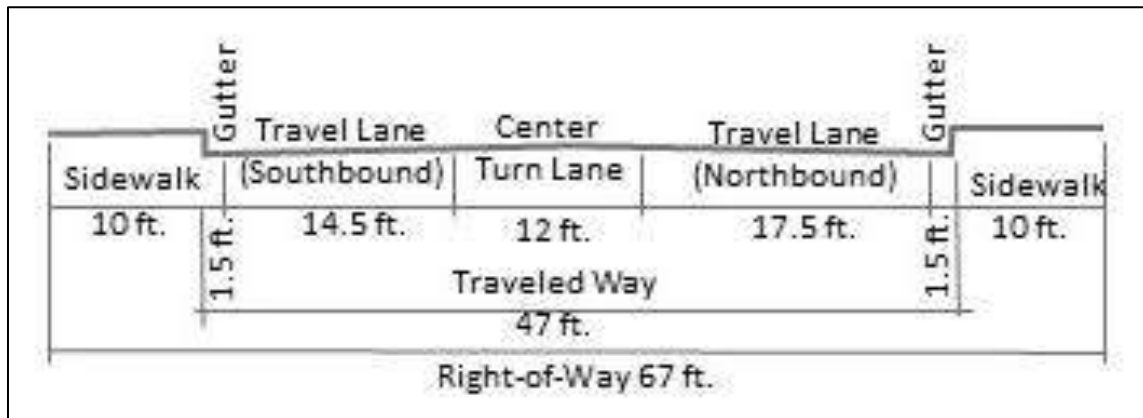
Recommended Improved Mid-Block Cross-Section for Cahuenga Road
